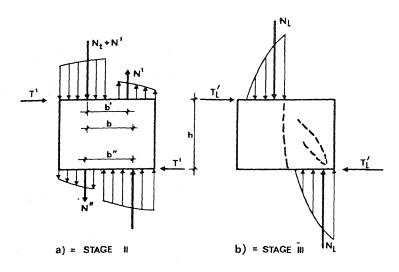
BOUNDARY FORCES ON A BRICK AT STAGES II AND III.
